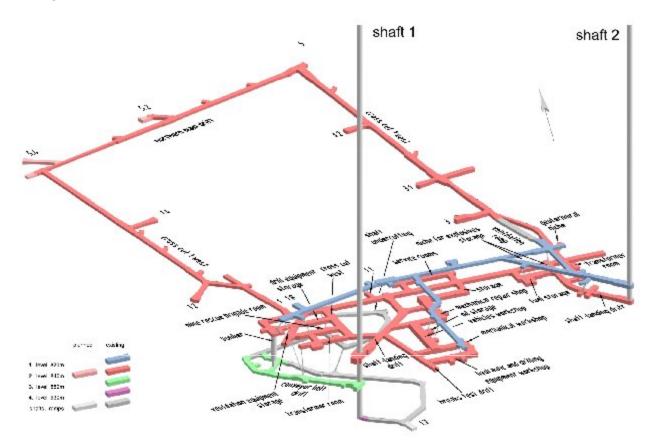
Layout of the present underground mine construction of the Gorleben site.
